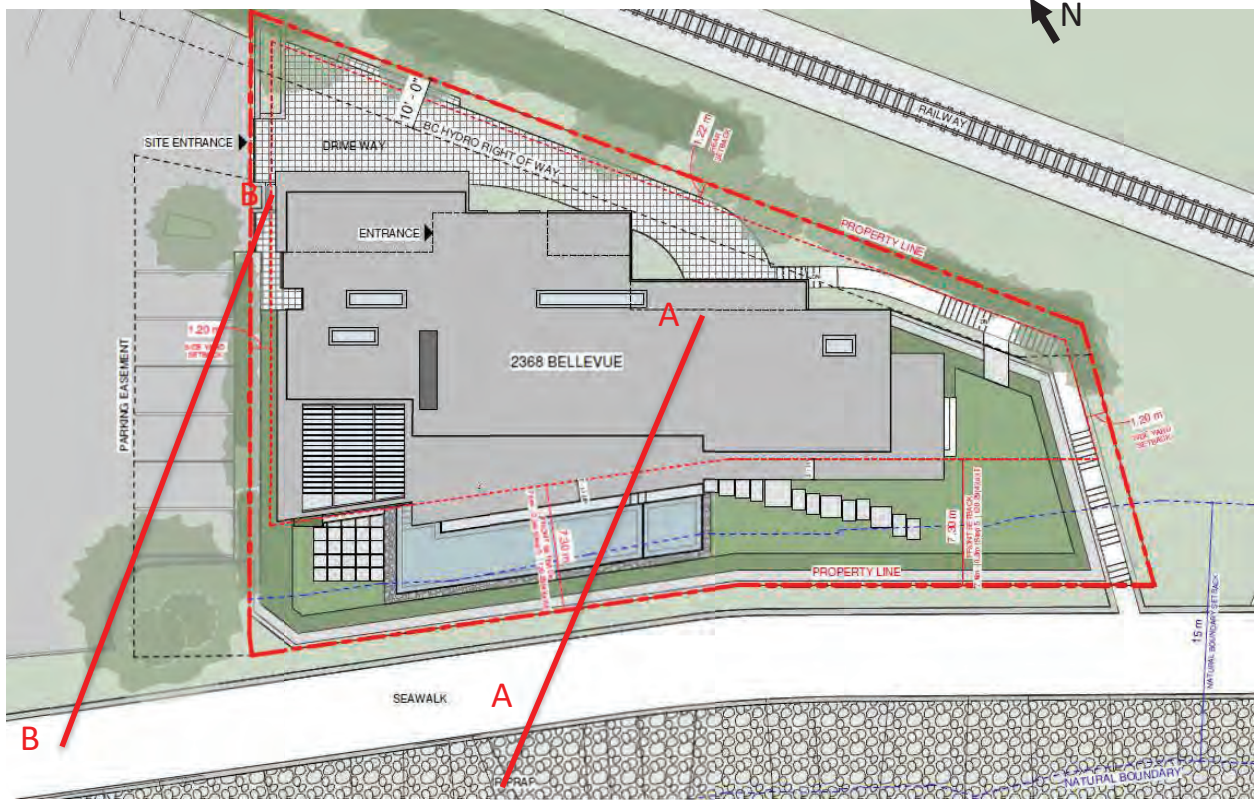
Plan view of the proposed development (A0.02 from the drawing set).
